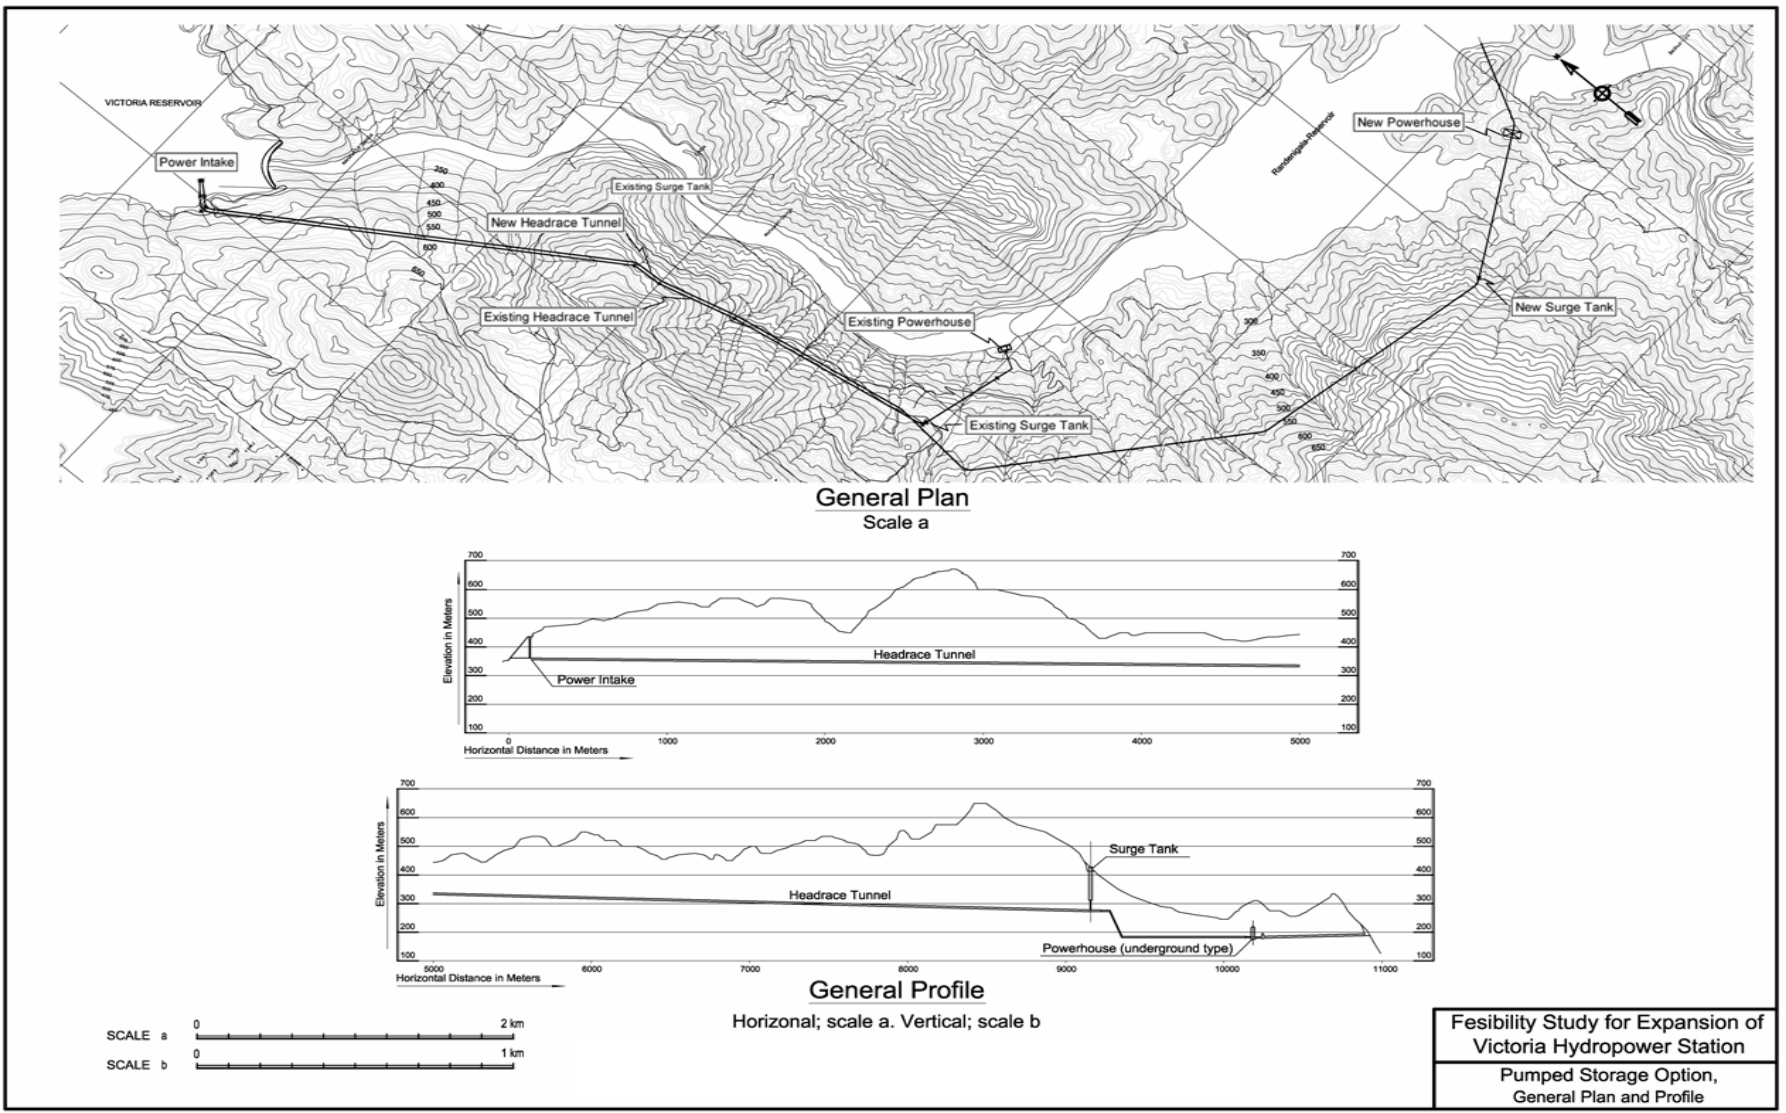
Pumped Storage Option: General Plan and Profile
